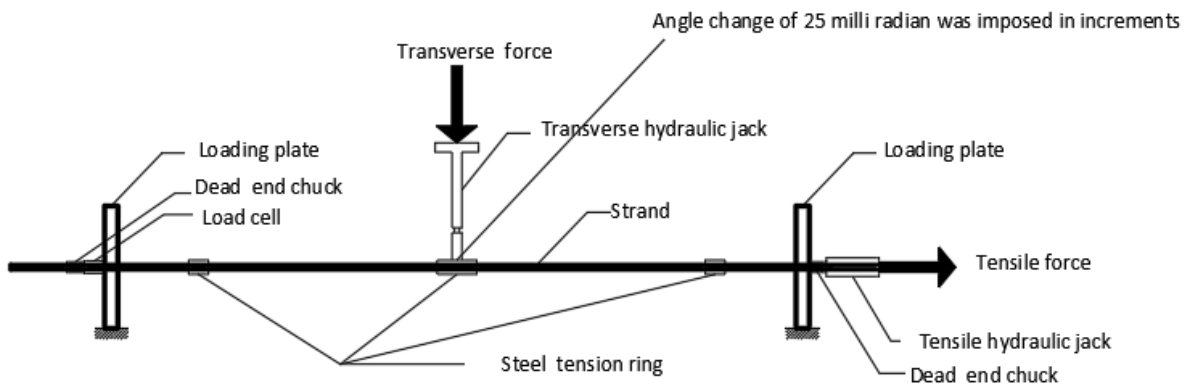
Loading frame and strand specimen for single strand test experiment
